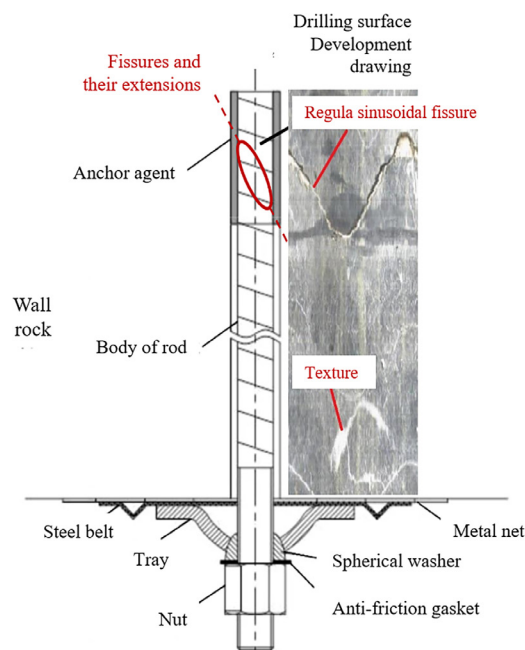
Schematic diagram of cracks in anchor bolt support and borehole imaging
